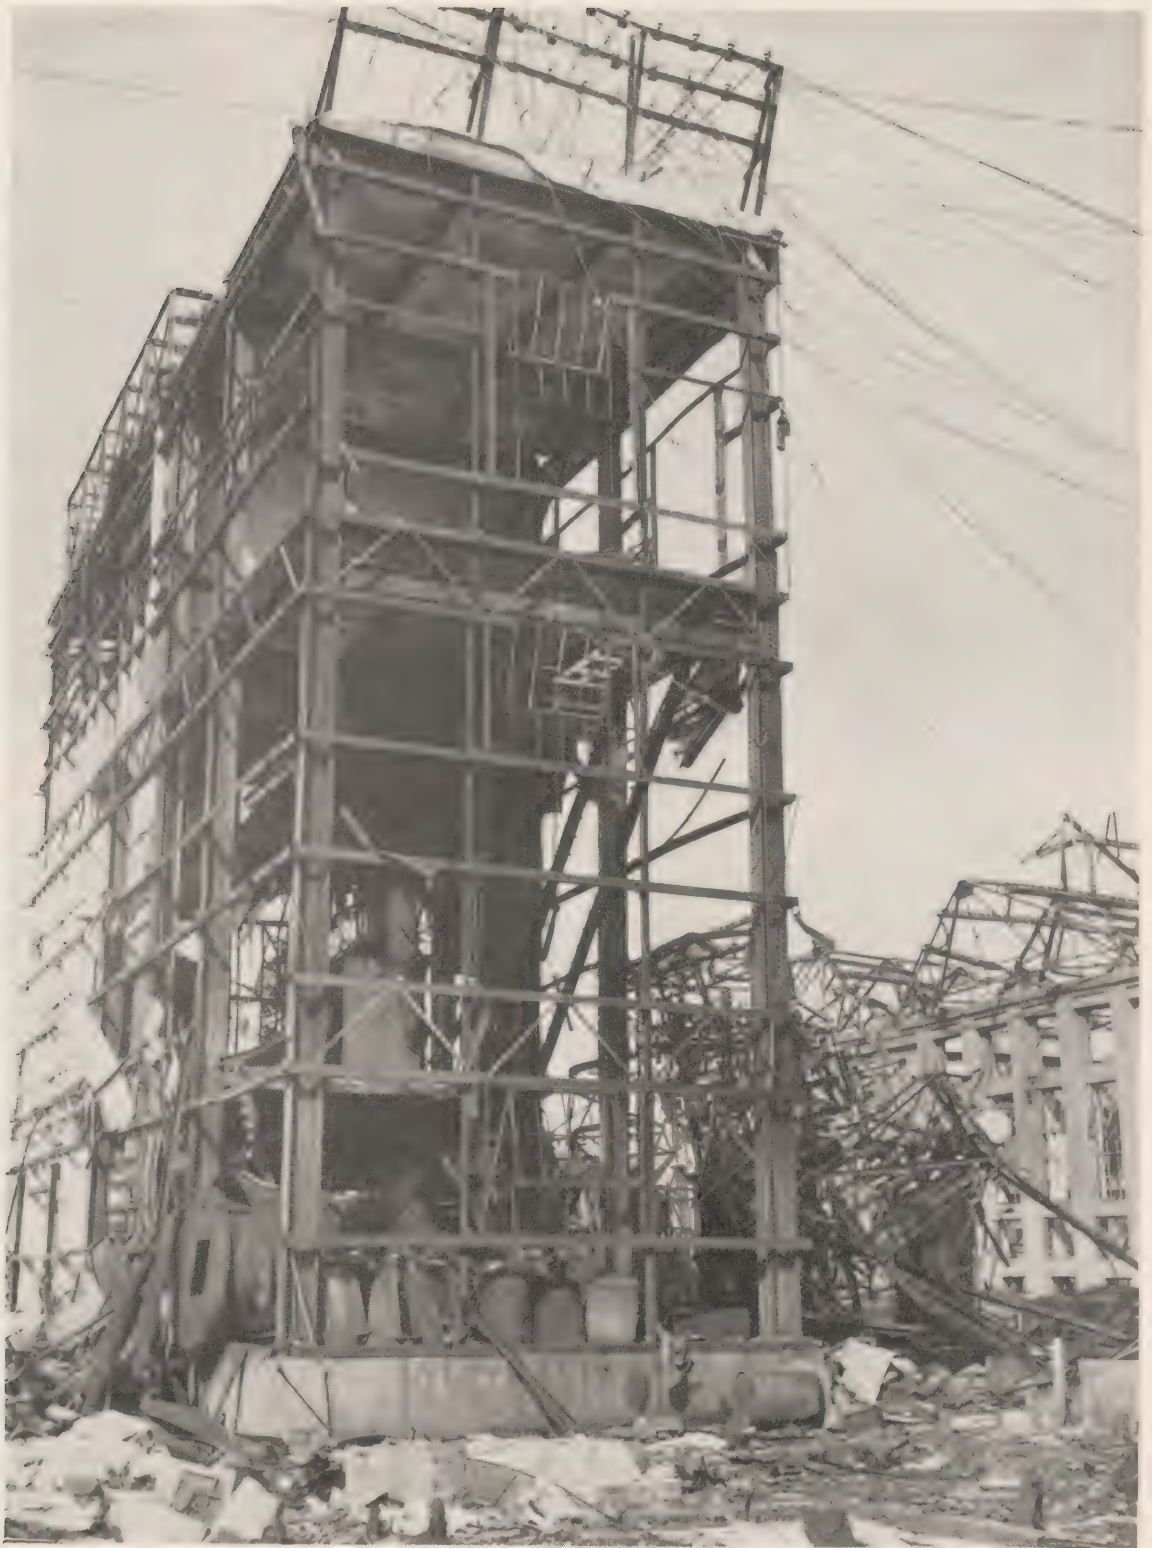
XIII. Blast and fire damage to Otemachi substation, 2,000 feet from GZ.
